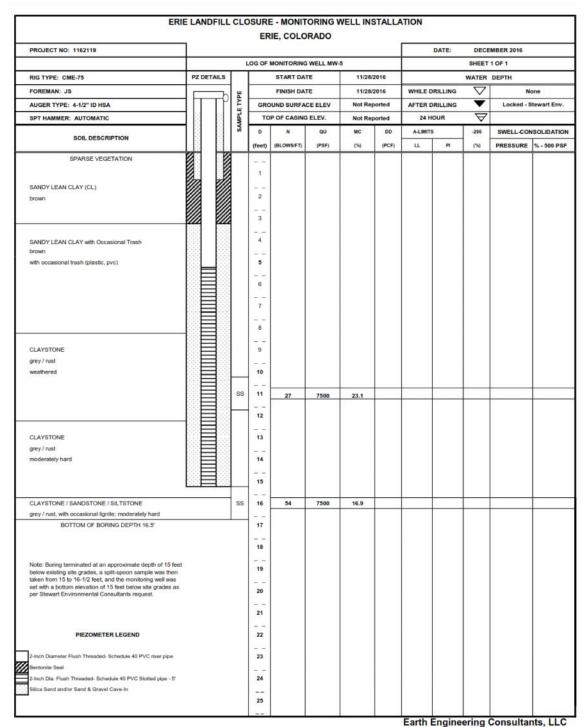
Earth Engineering Test Boring SEC MW-5
